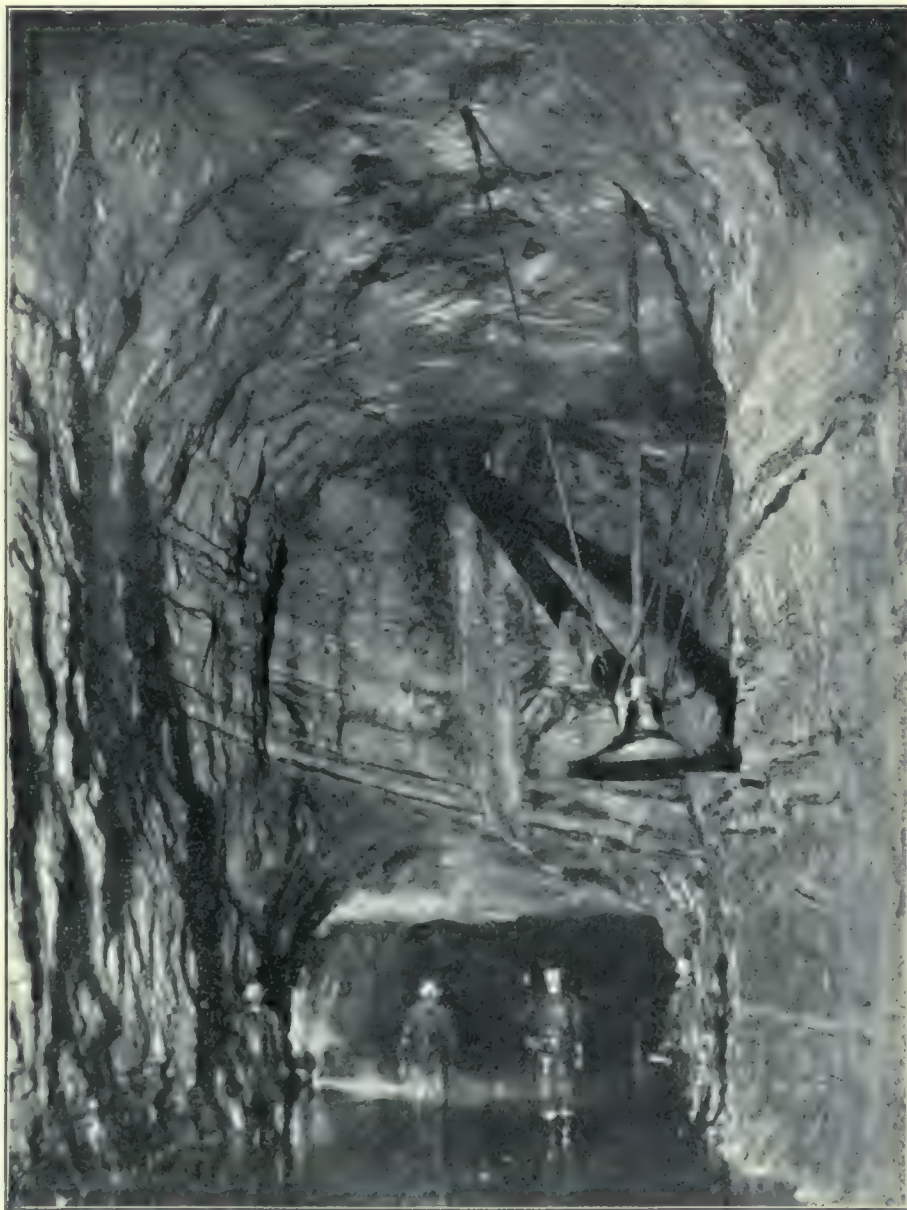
Flash-light view showing outlet end of air-separating chambers. In the upper corner the end of the 24-in. air-main is shown with a strainer at its end; leading down with a saucer piece on its end is the 12-in. blow-off pipe. The low tunnel at the bottom is the water escape which connects with a tail-race shaft.
